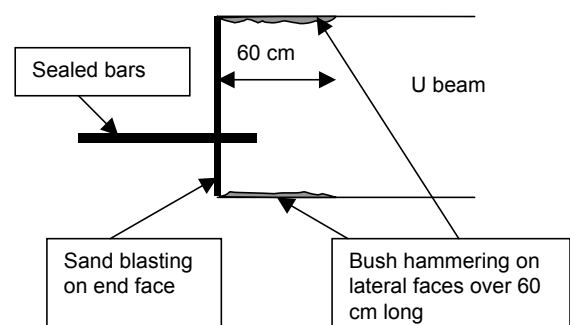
Detail of end beams preparation before casting diaphragms – plant view
